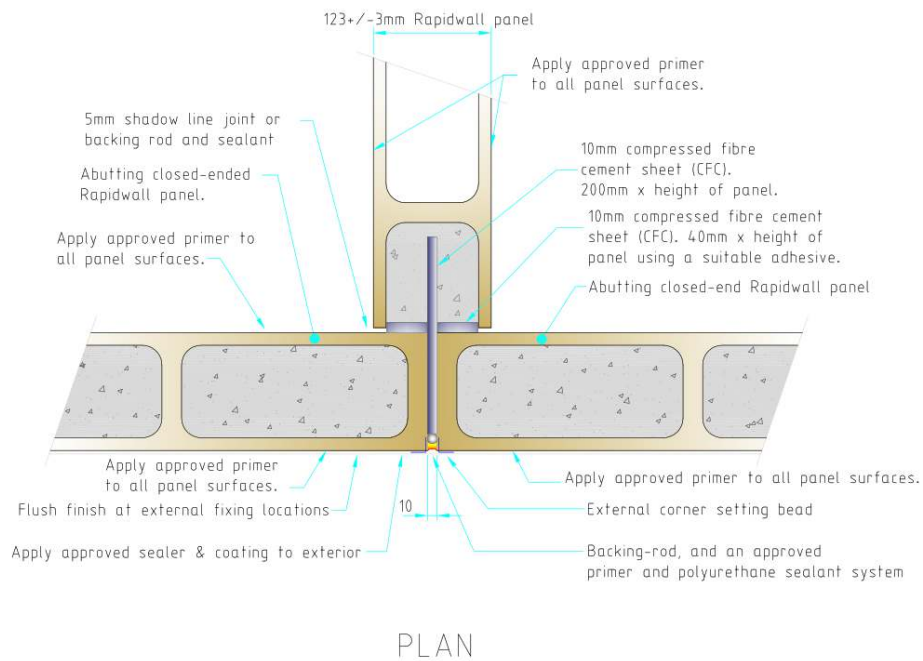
Blind Control Joints T inter section Concrete filled panels
